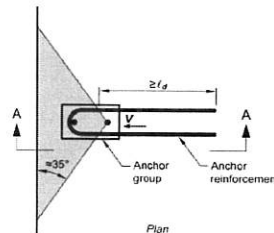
(a)—Hairpin anchor reinforcement for shear.
